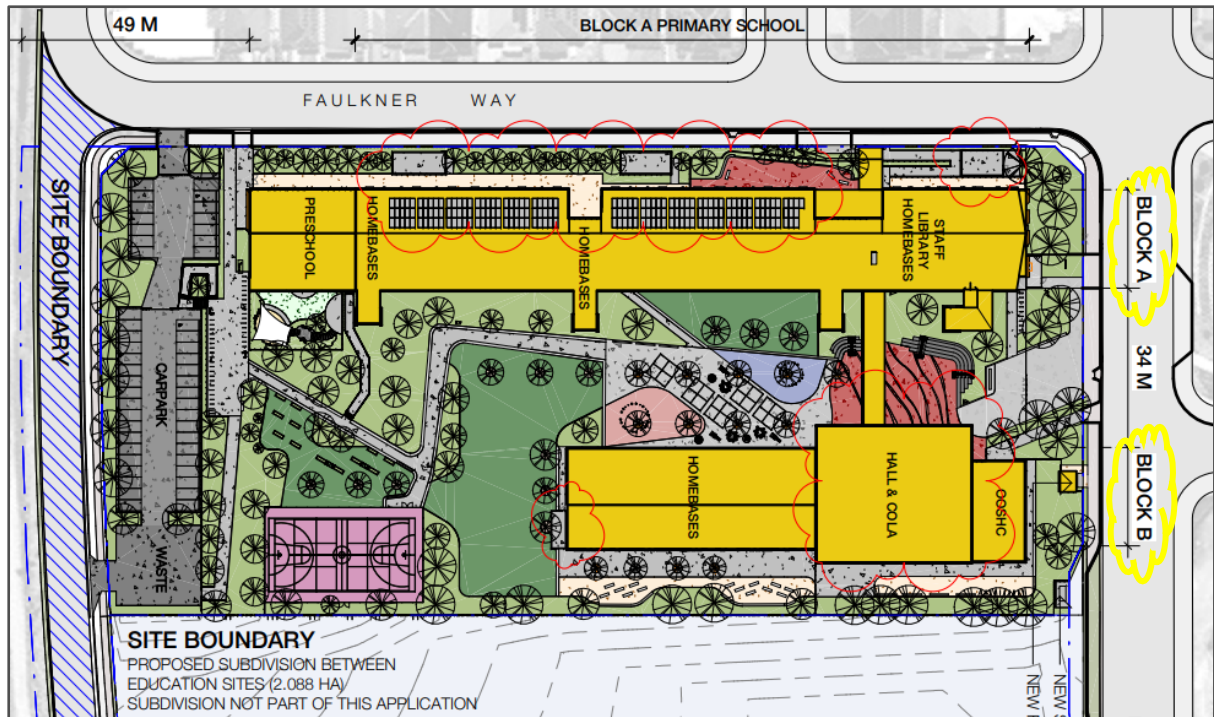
| Architectural Plans – amendments (Source: Applicants amended Architectural package)
